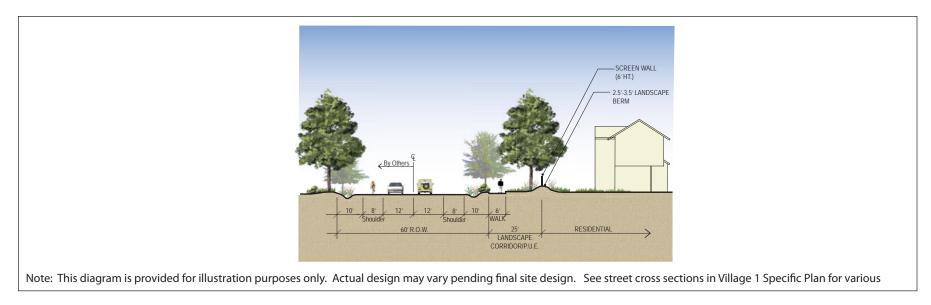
Collector Street Landscape Cross Section - Ferrari Ranch Road (Typical)
